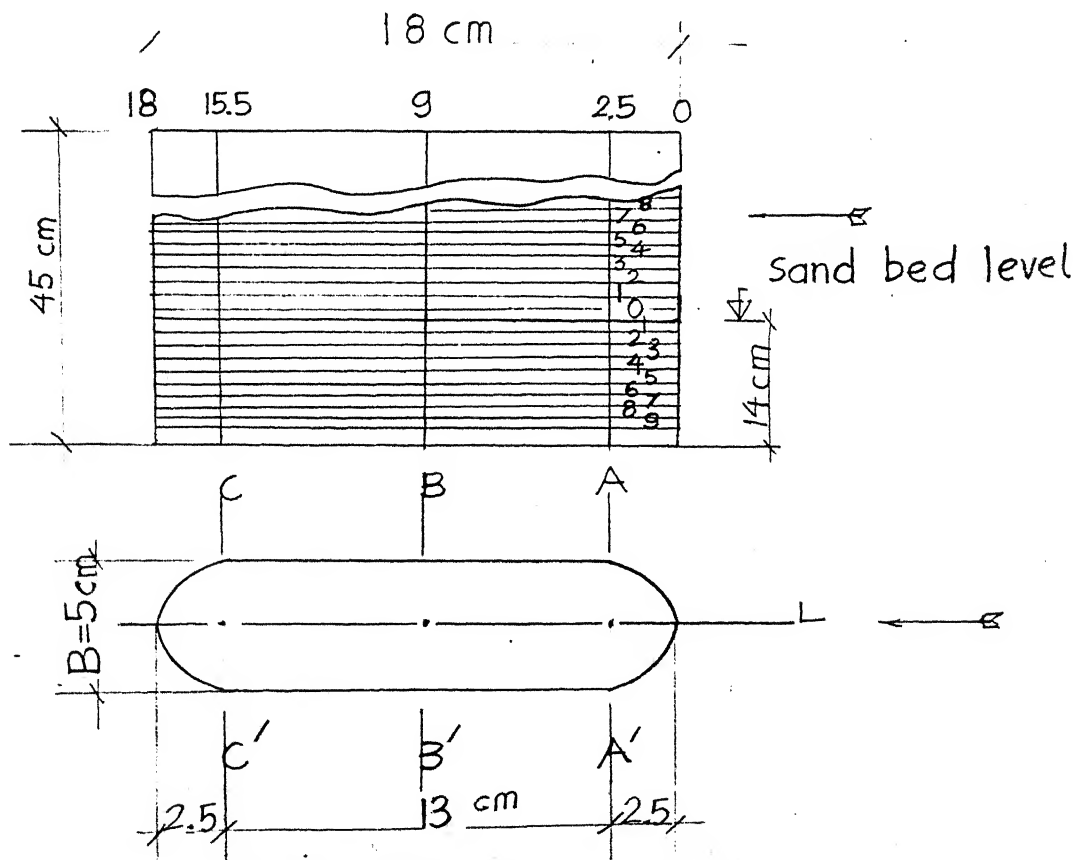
SCHEMATIC PIER WITH SCALE AND LOCATION OF SECTION LL', AA', BB', CC'
